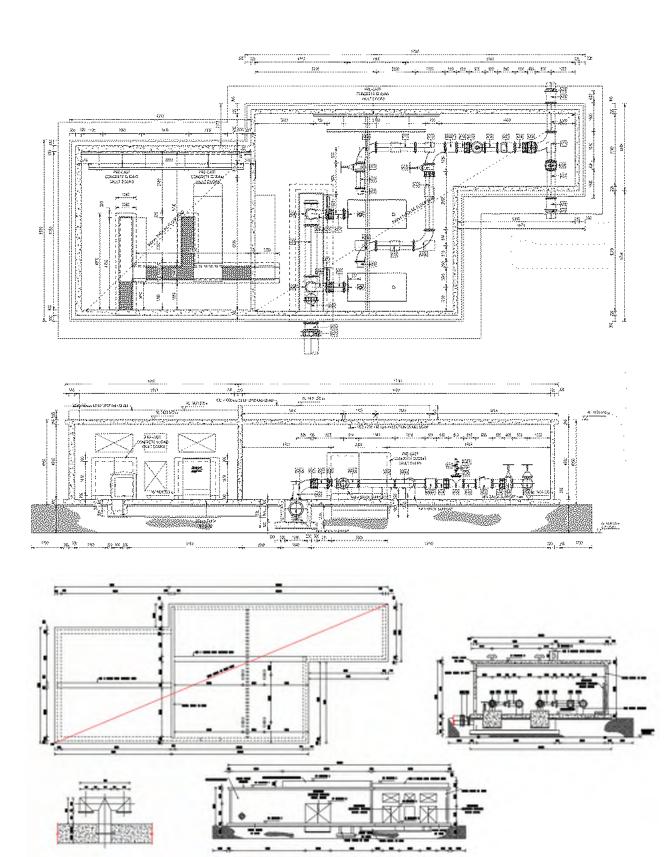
,22 & 23 – Screenshots from Detail Design Drawings for the De Put Booster Pump Station E.g. Plan View and Sections (Refer to Appendix C for Detail Design Drawings)
